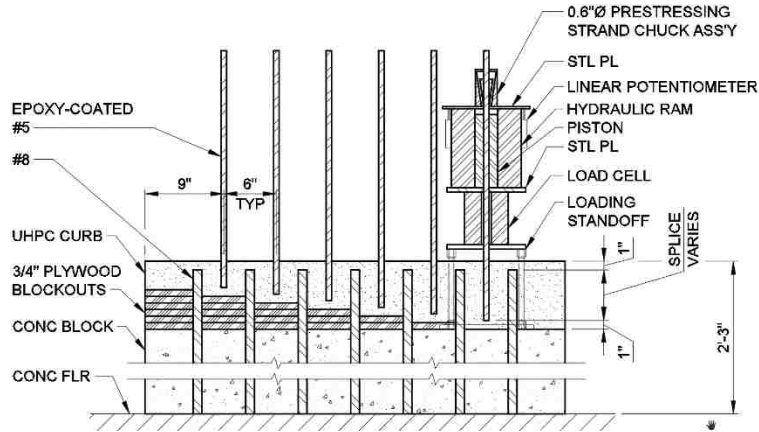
Longitudinal cross-section through a representative splice curb with testing apparatus shown on one specimen.
